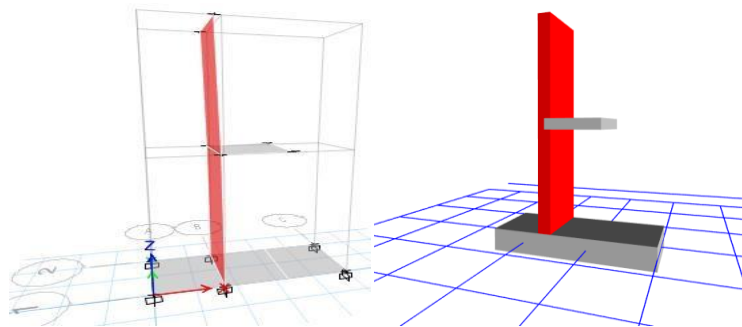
Deformed shape after adding load and rendered view of retaining wall with shelf.
